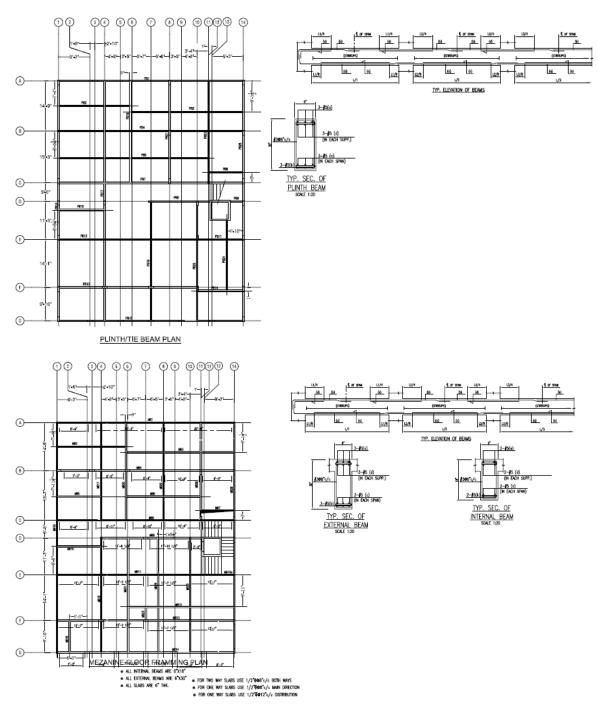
Structural framing for plinth level (top) and mezzanine level (bottom)
